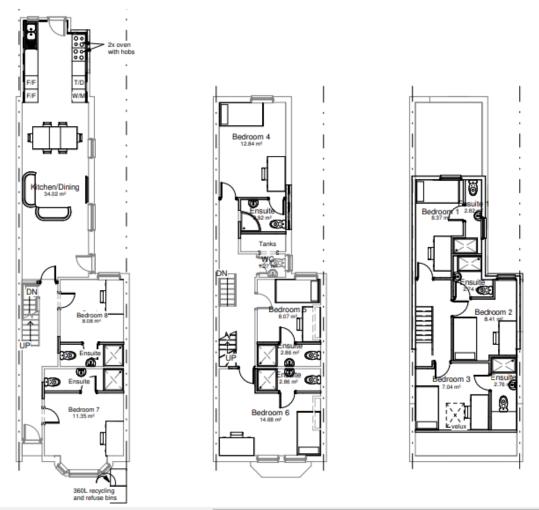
Floor plans - it should also be noted that the property benefits from a basement room
